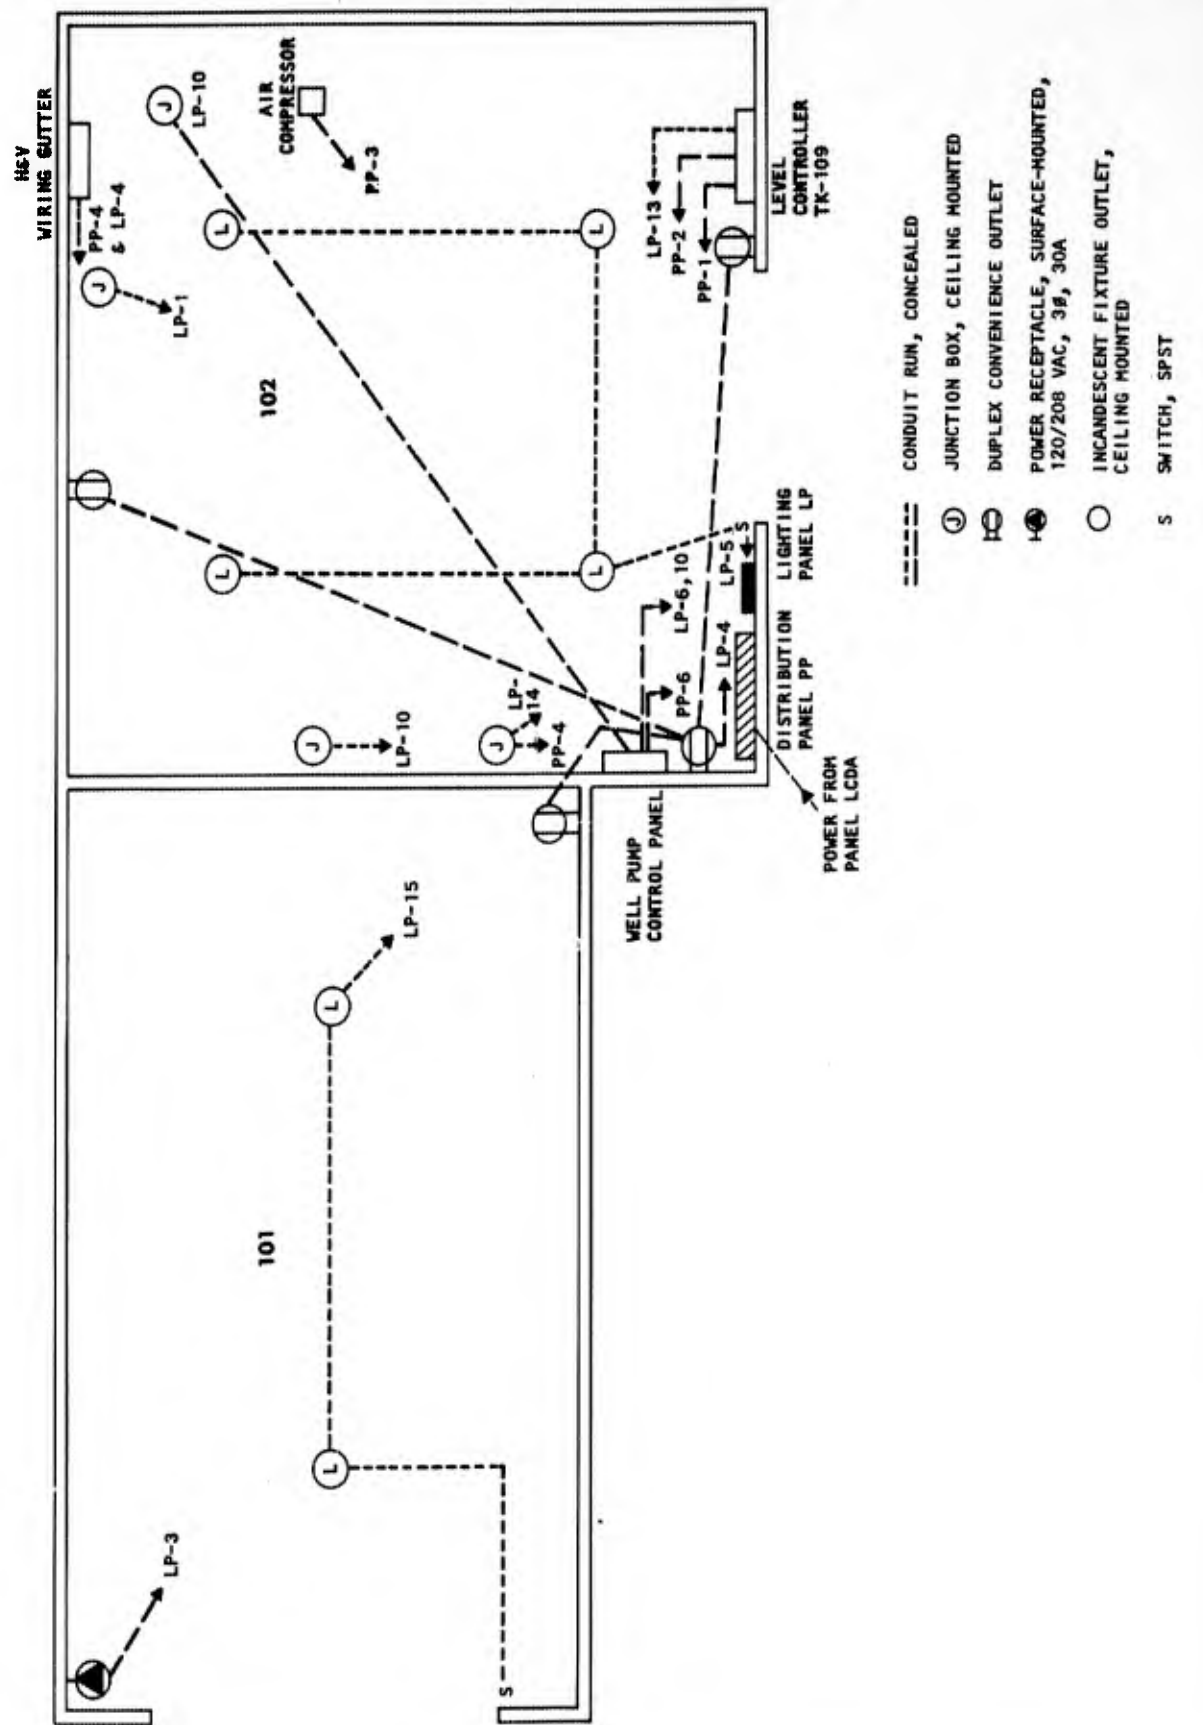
LCF Water Well Pump House Power, Lighting and Receptacle Plan
